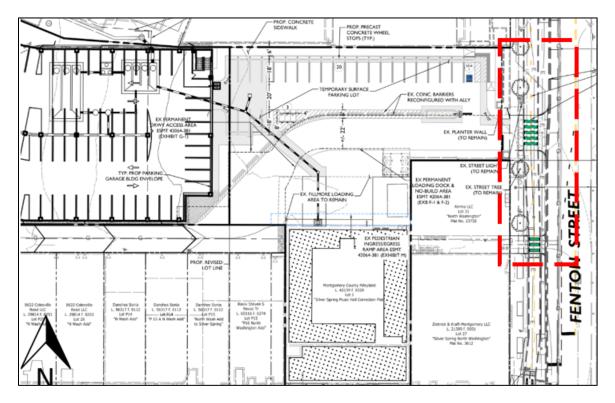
Site Plan showing Fenton Street Bikeway to be built by MCDOT, frontage shown in red dashed box.
